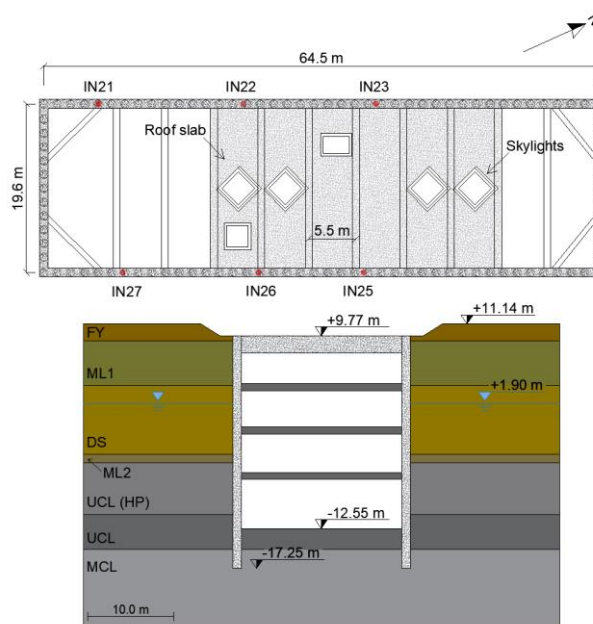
Temporary retaining system: (a, top) Plan drawing (b, bottom) cross section drawing (DVR90 datum)
